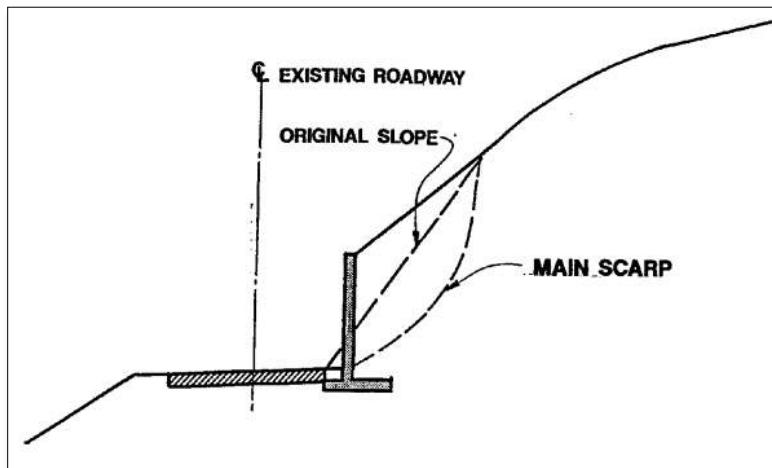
Schematic of a Conventional Concrete Cantilever Wall to Repair a Landslide [50]
